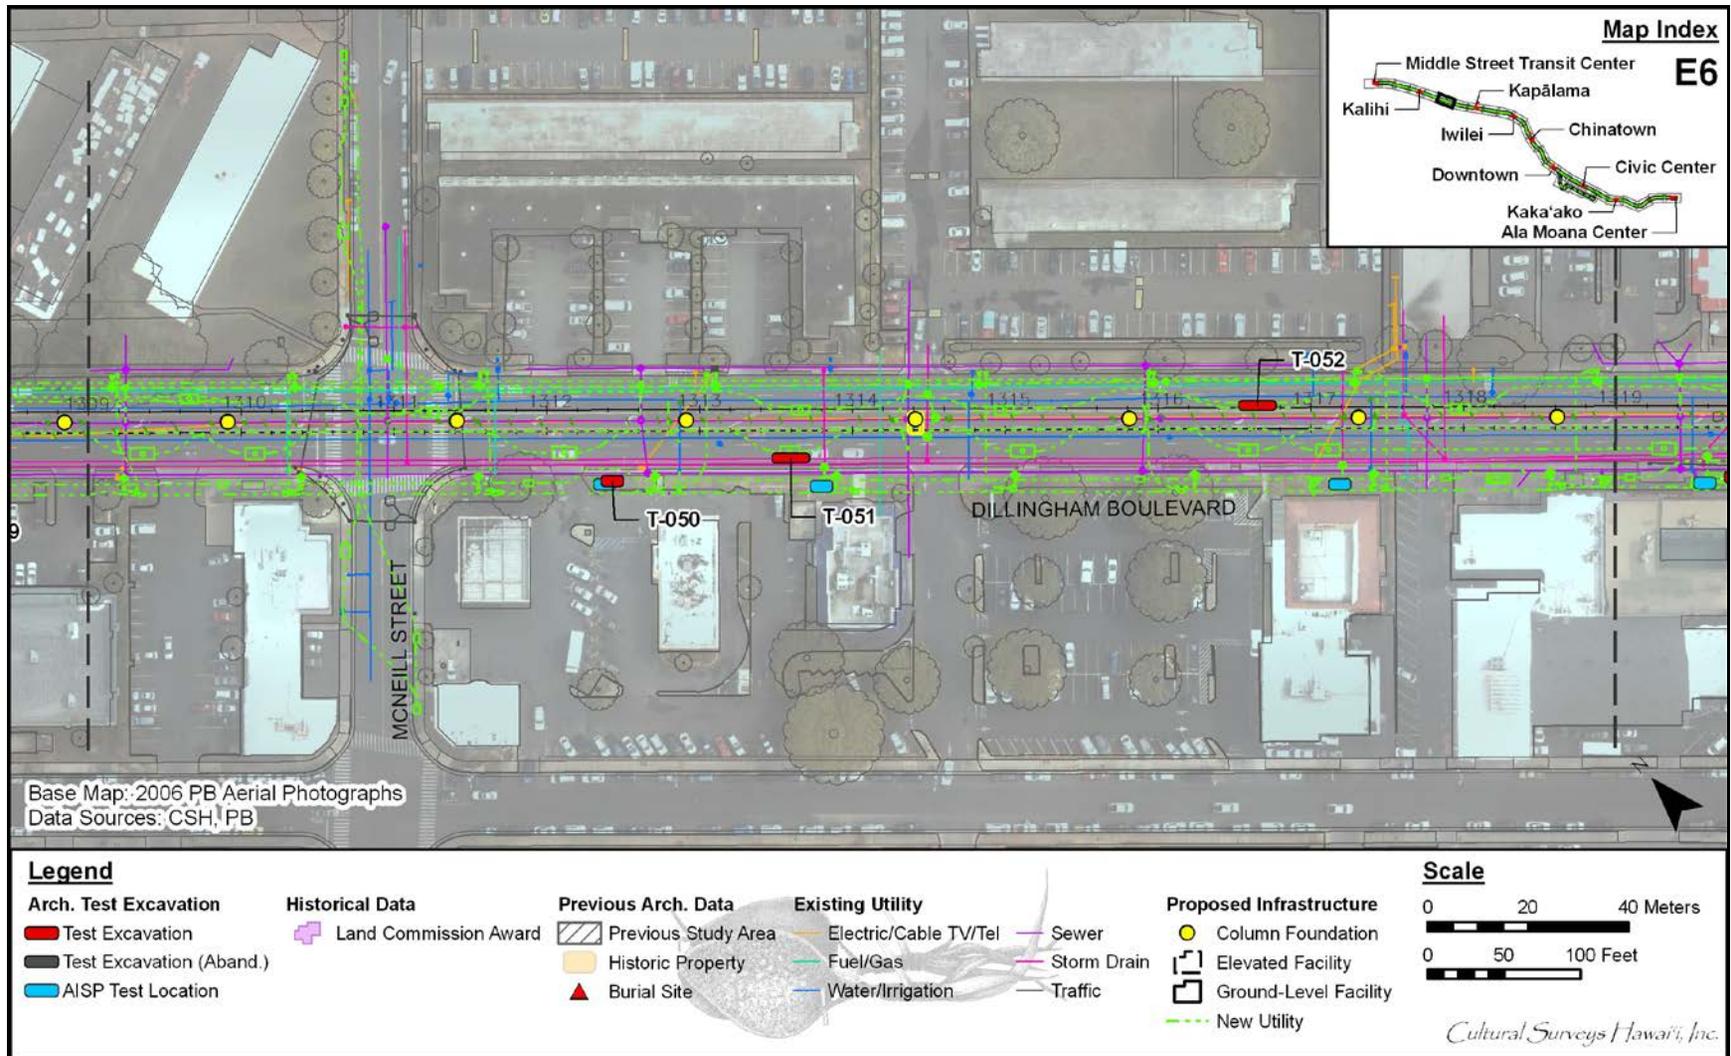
Map E6 (Dillingham Boulevard near McNeill Street) showing locations of proposed AISP and actual AIS test excavations
